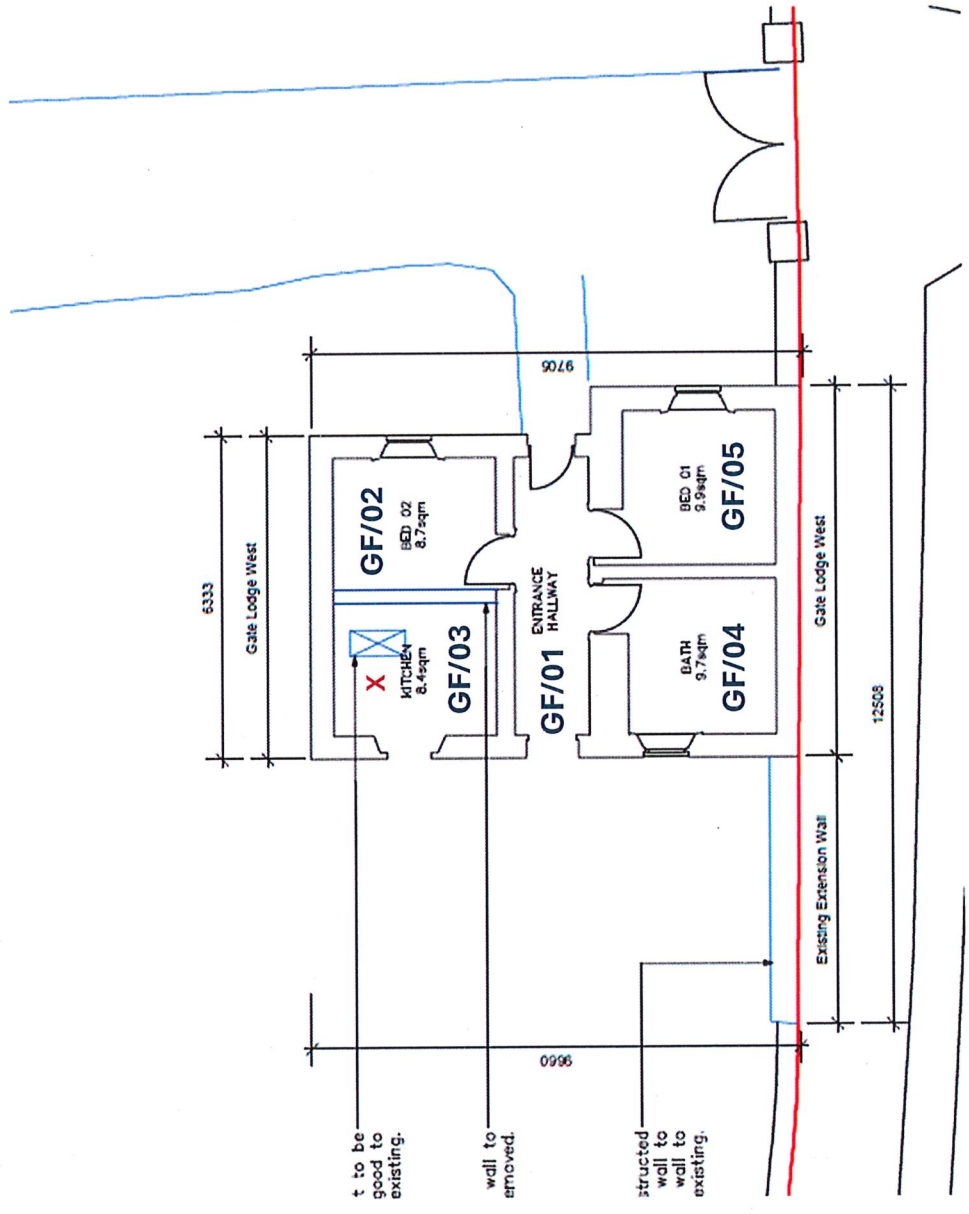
Knockrabo Gate Lodge (West) – Ground Floor Plan
